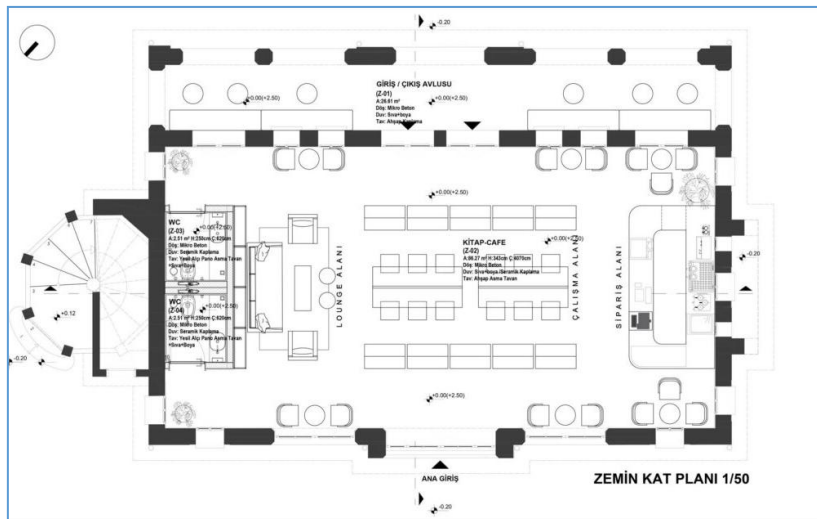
The ground floor plan of Moda pier after the revitalization (Source: Çınar, 2023)
